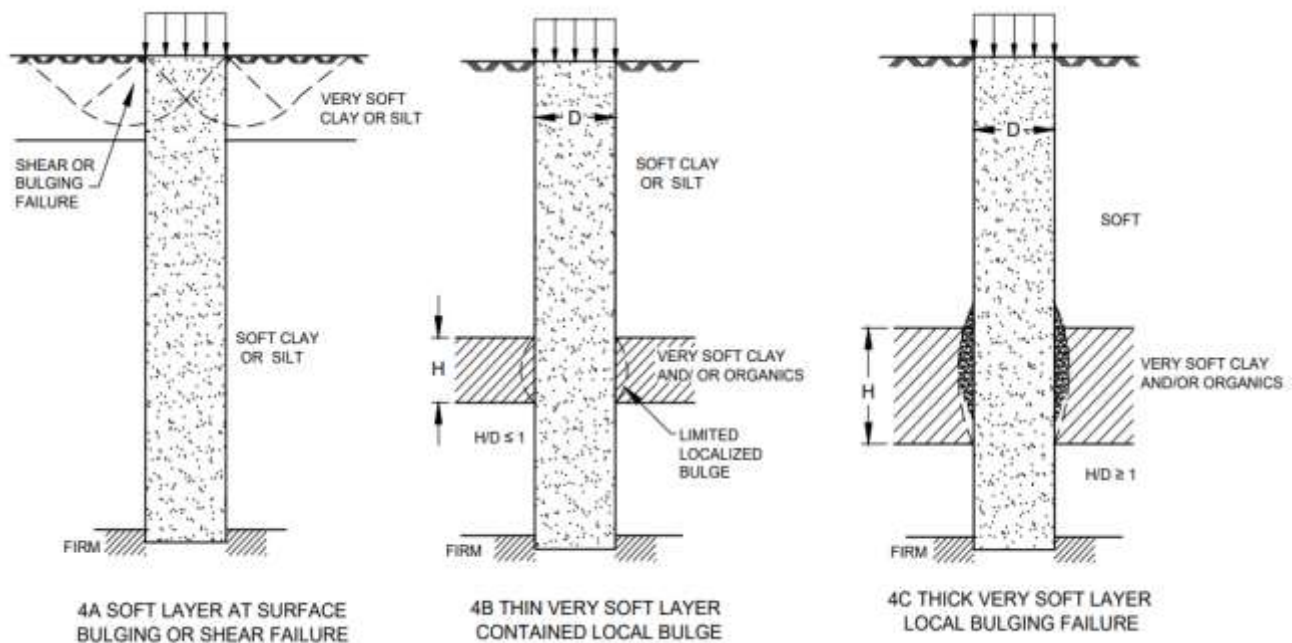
STONE COLUMN FAILURE MECHANISMS IN NON-HOMOGENOUS COHESIVE SOIL
